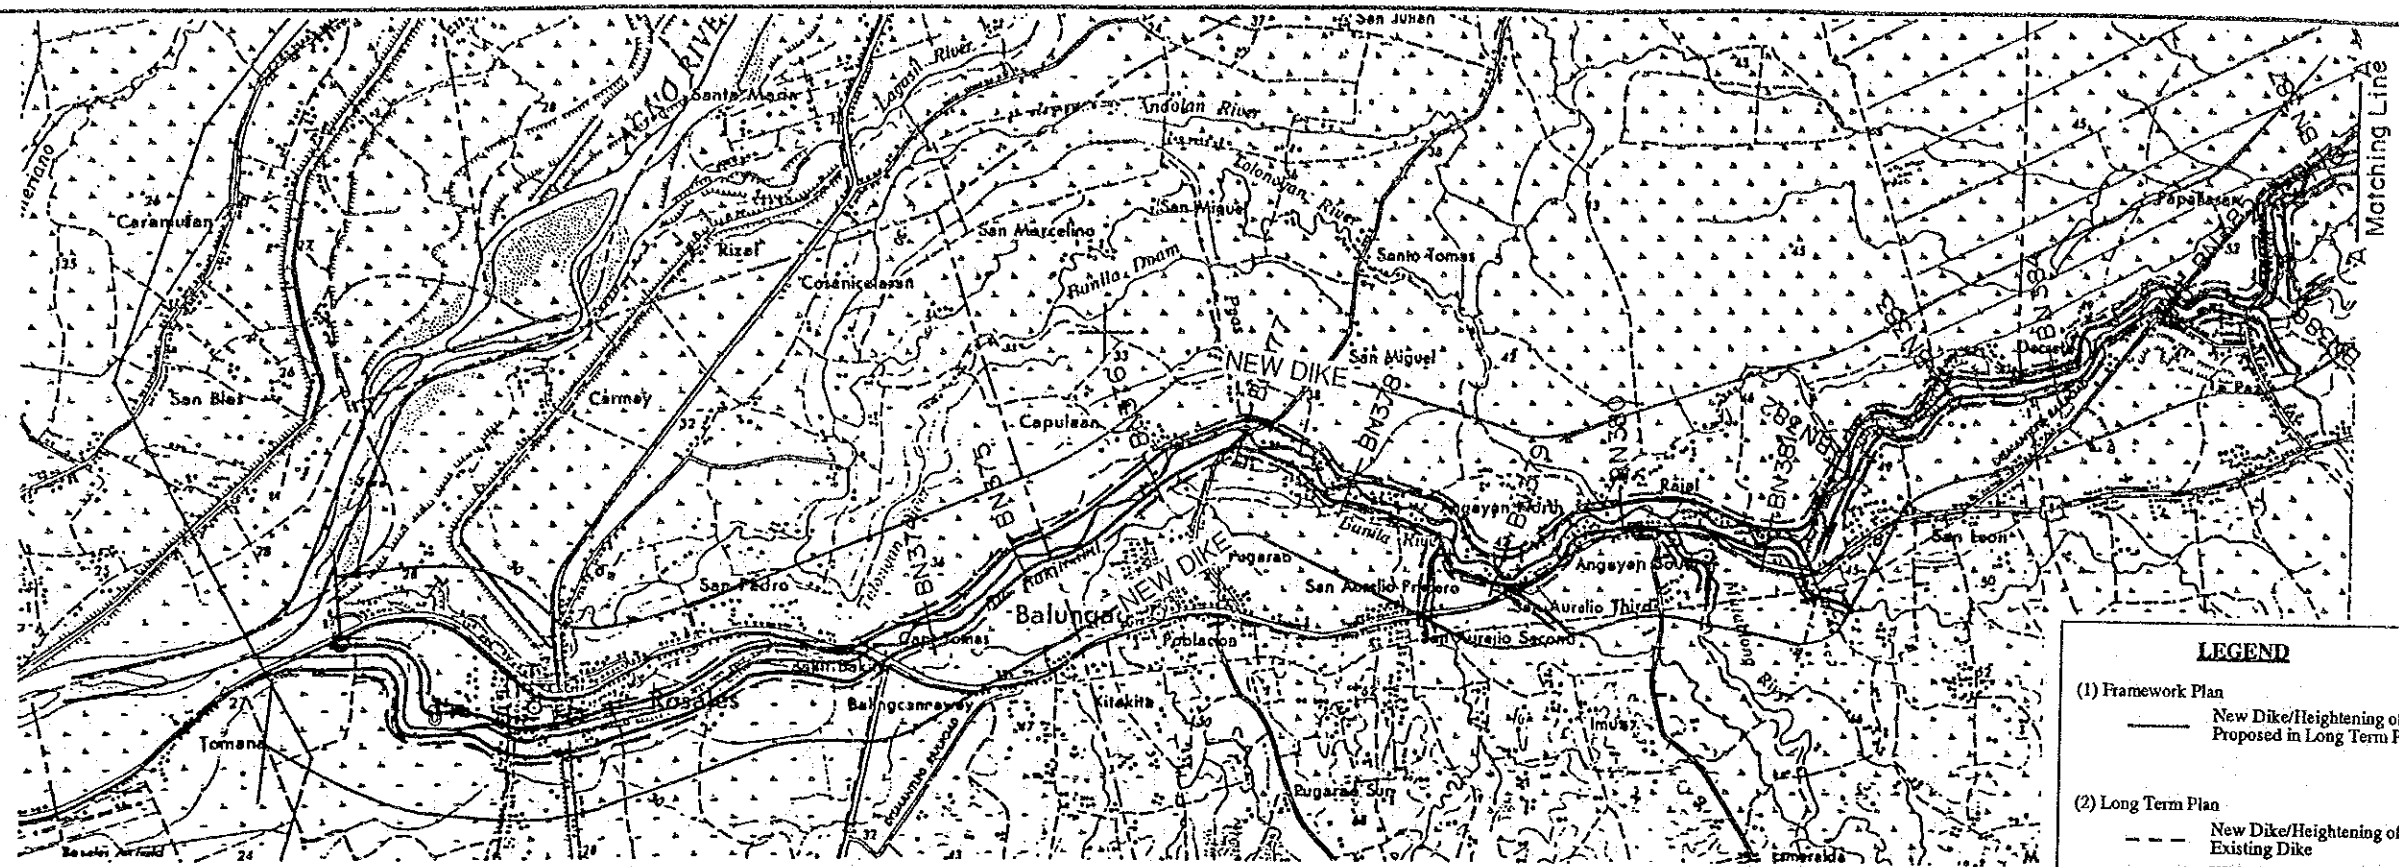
DESIGN PLAN OF CAMILING RIVER
